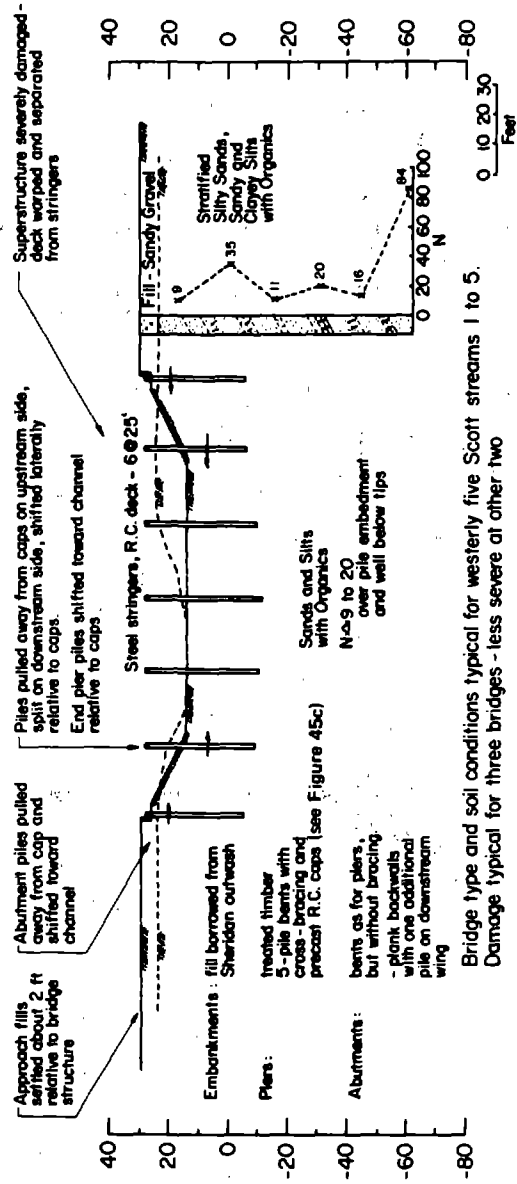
Bridge 348: Scott Glacier stream (centerline section looking upstream - natural scale).
